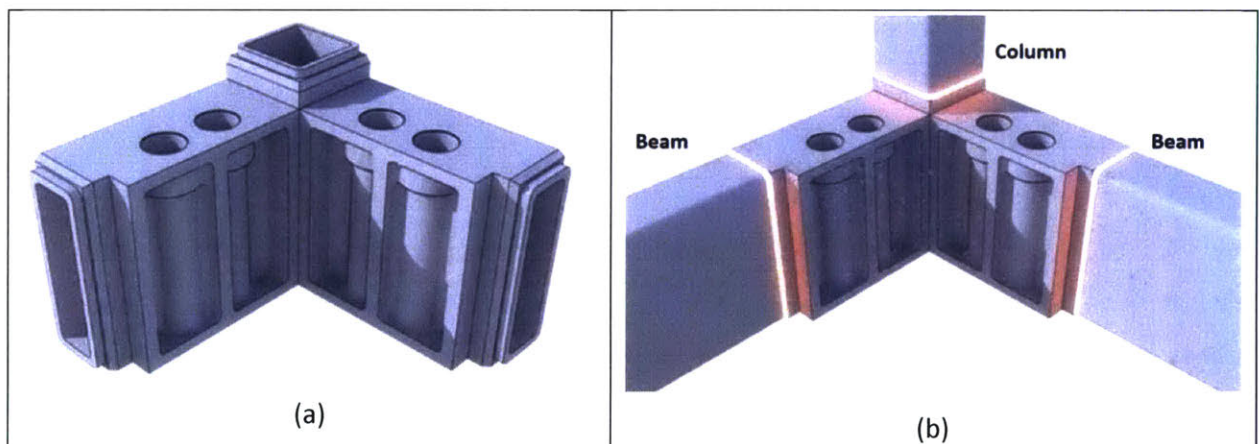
RIGID MODULAR CONNECTION. (A) CAST IN PLACE STEEL CORNER (B) WELDING OF CORNER PIECE TO MODULE
